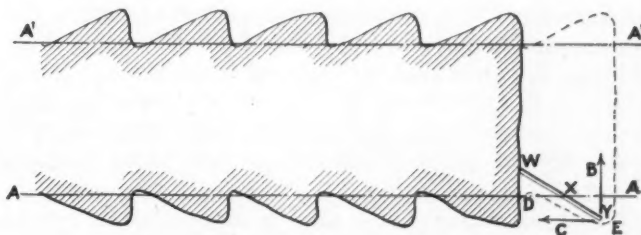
Effect of Blasting on a Saw-Tooth Rib
